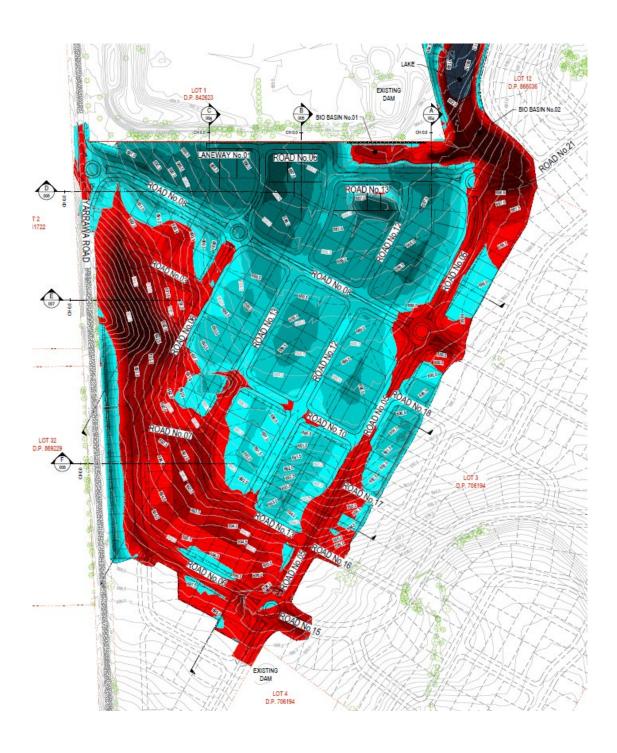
Proposed Stage 1 subdivision in south west corner of the site
